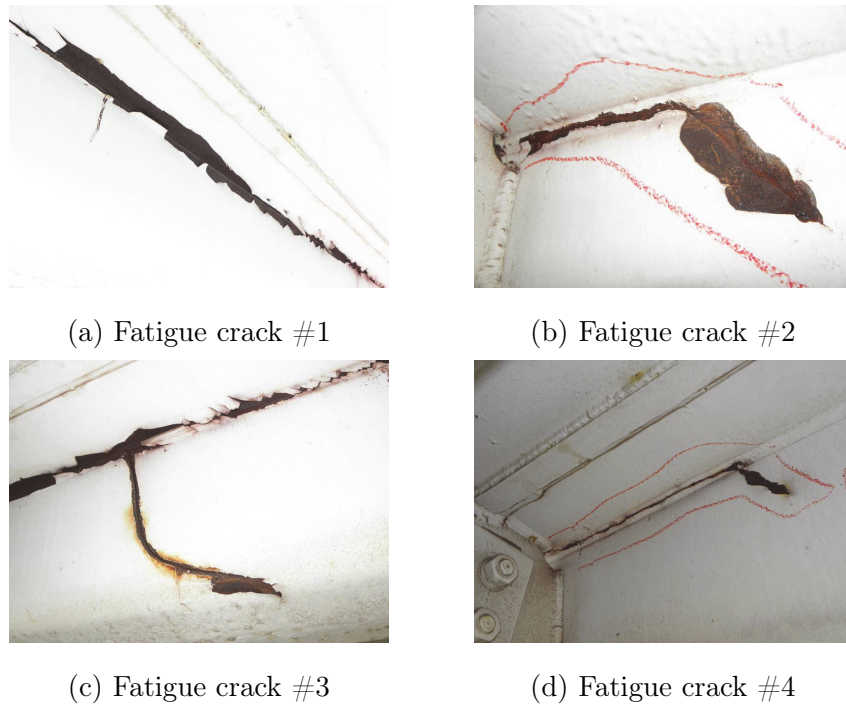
Observed fatigue cracks on the bridge case study
